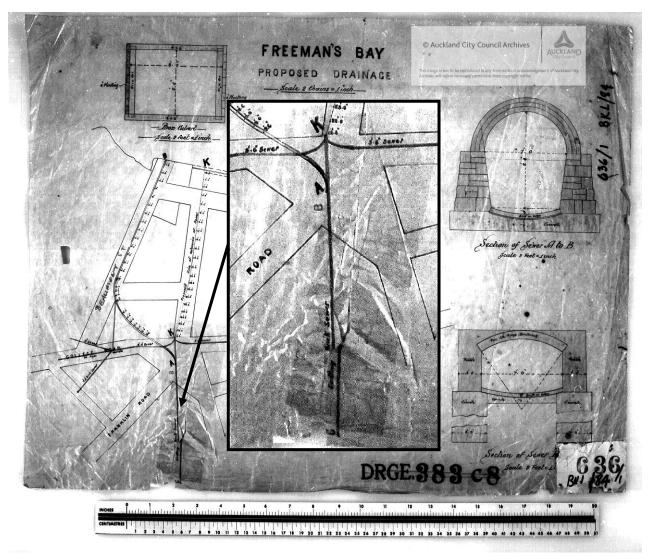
The drainage plan illustrating the Freemans Bay Stormwater/sewer as the 'existing brick sewer' (inset). The culvert profile in the top right corner was similar to that of Freemans Bay sewer (Auckland Council Archives 033, DRGE 636)
